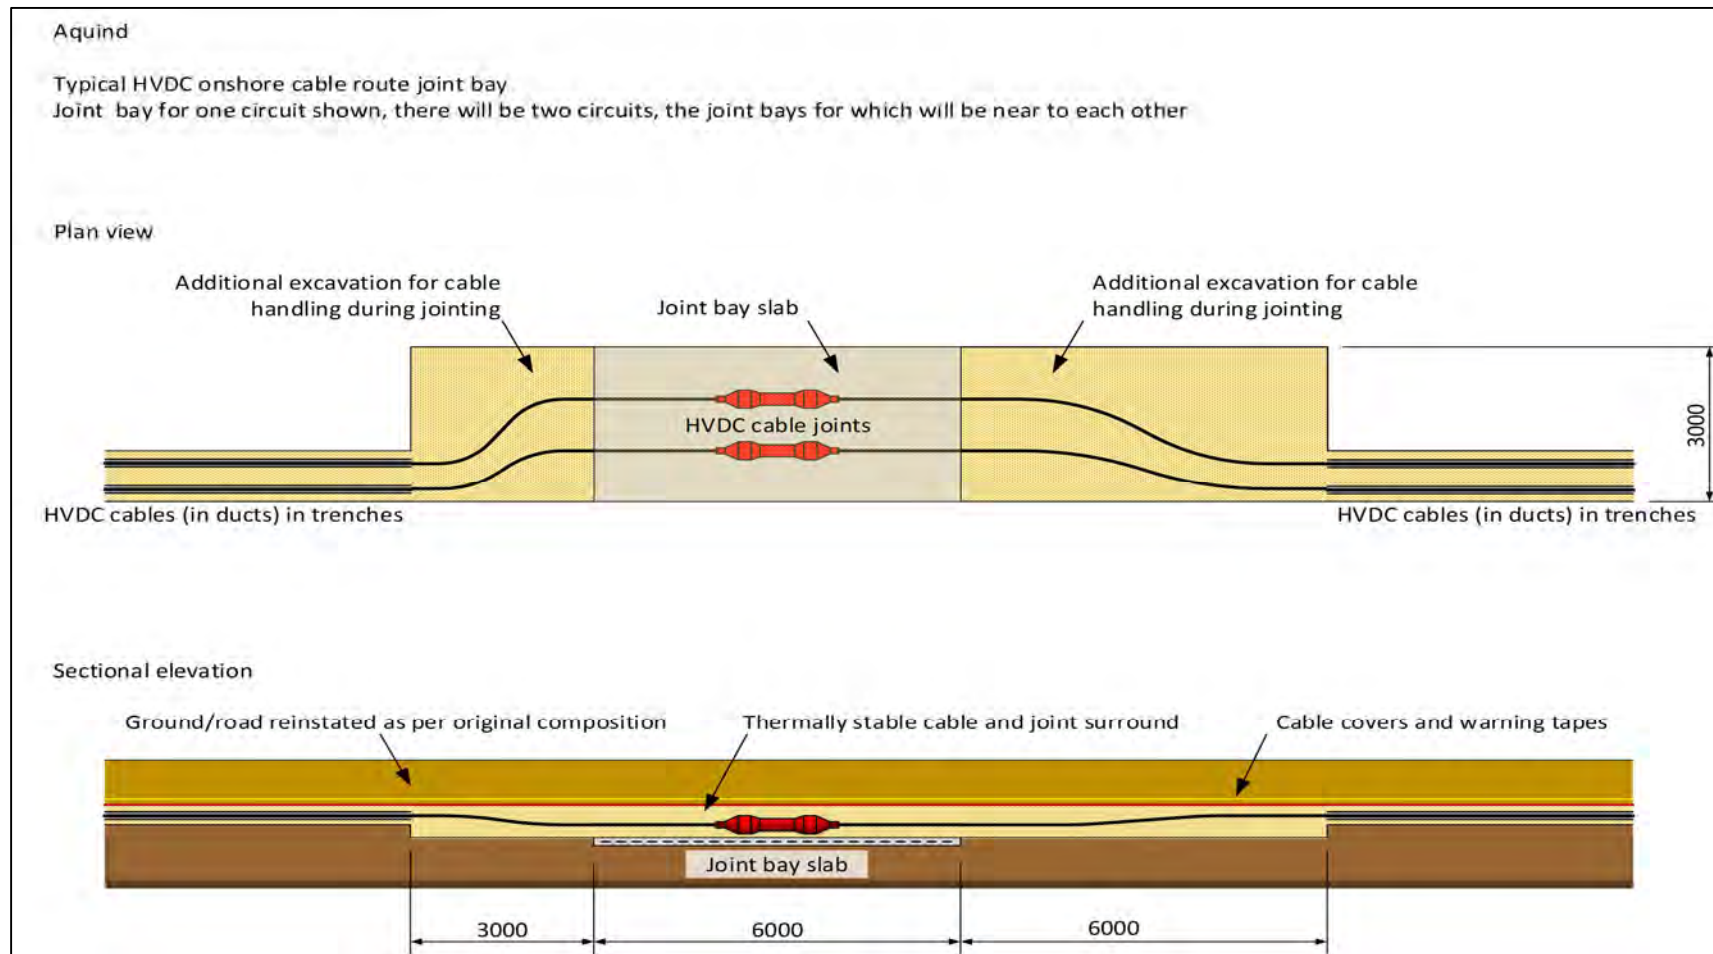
Typical Schematic of Joint Bay (distances in millimetres)
